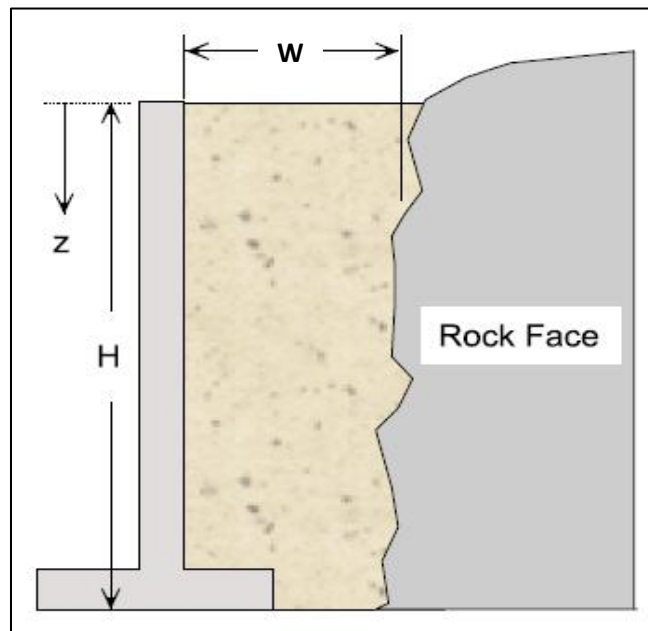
Narrow retaining wall (Yang & Liu, 2007).
